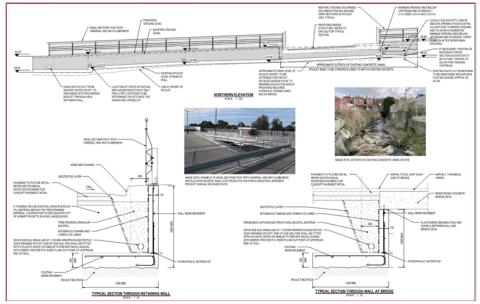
proposed bridge and retaining wall within the Providence Rivulet
